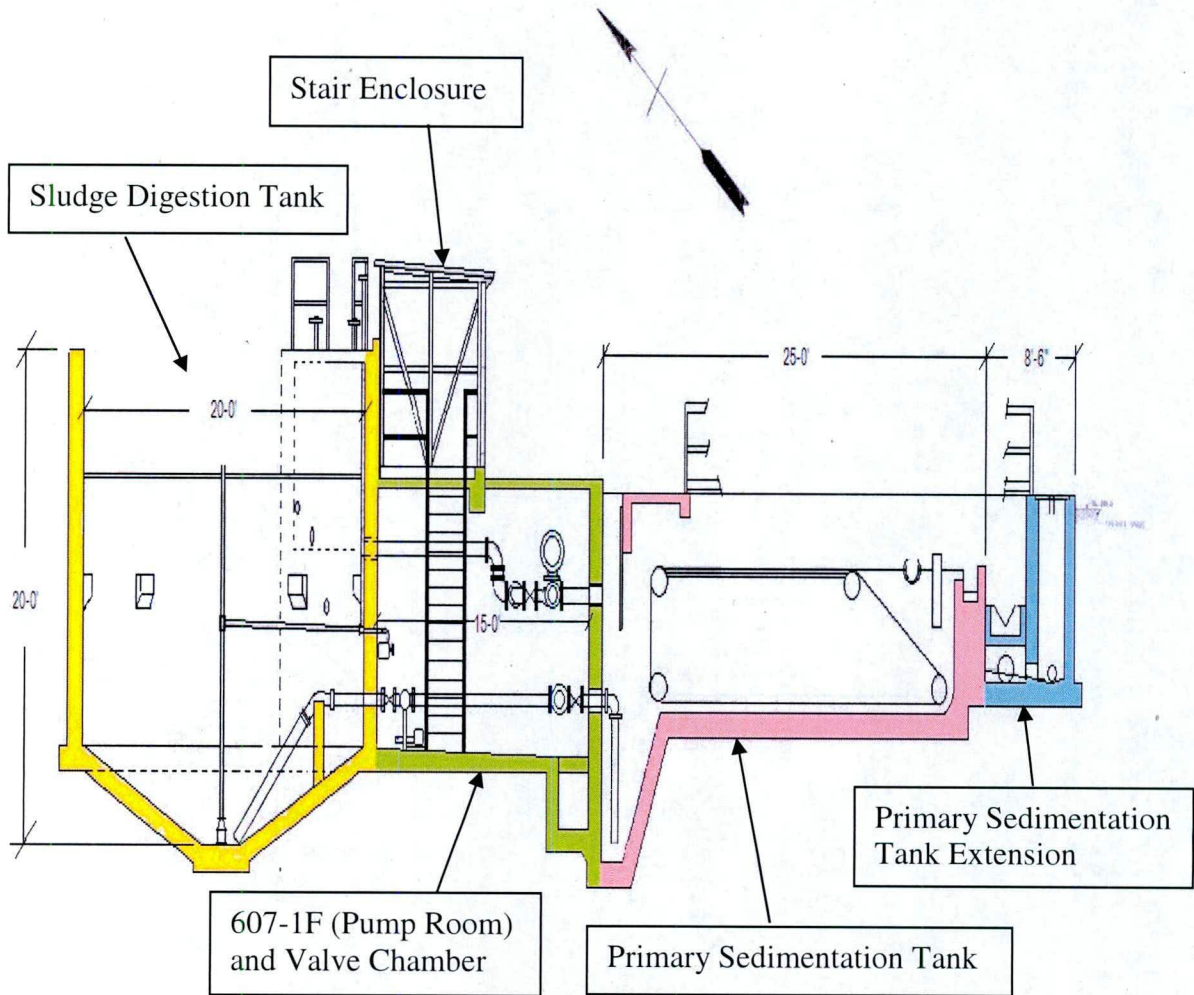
Section View of 607-1F Sewage Treatment Plant
